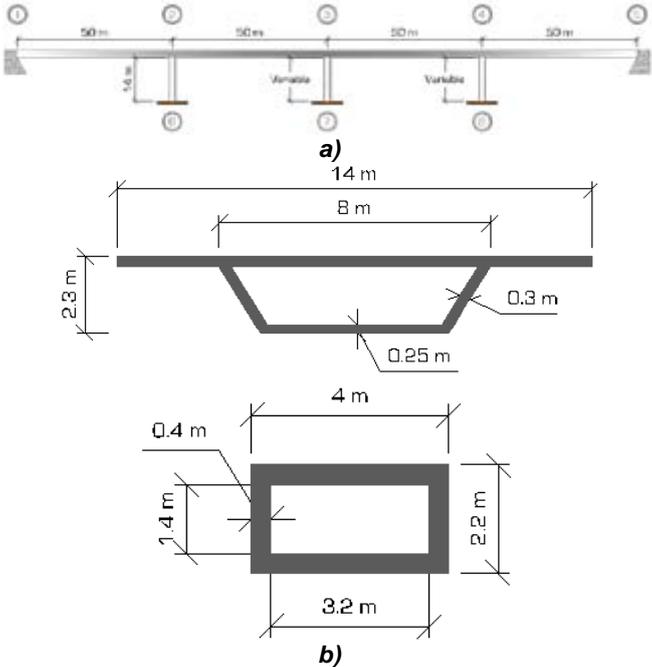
Regular model, a) elevation, b) girder and pier transversal section
